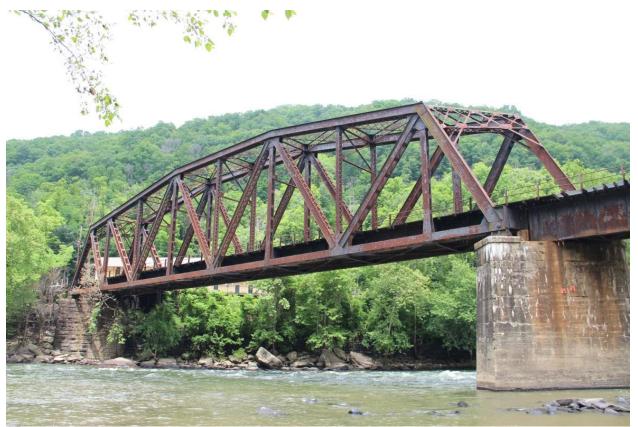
WEST PROFILE OF MAIN WARREN TRUSS SPAN, SHOWING SKEWED SOUTH PORTAL, FACING NORTHEAST.
